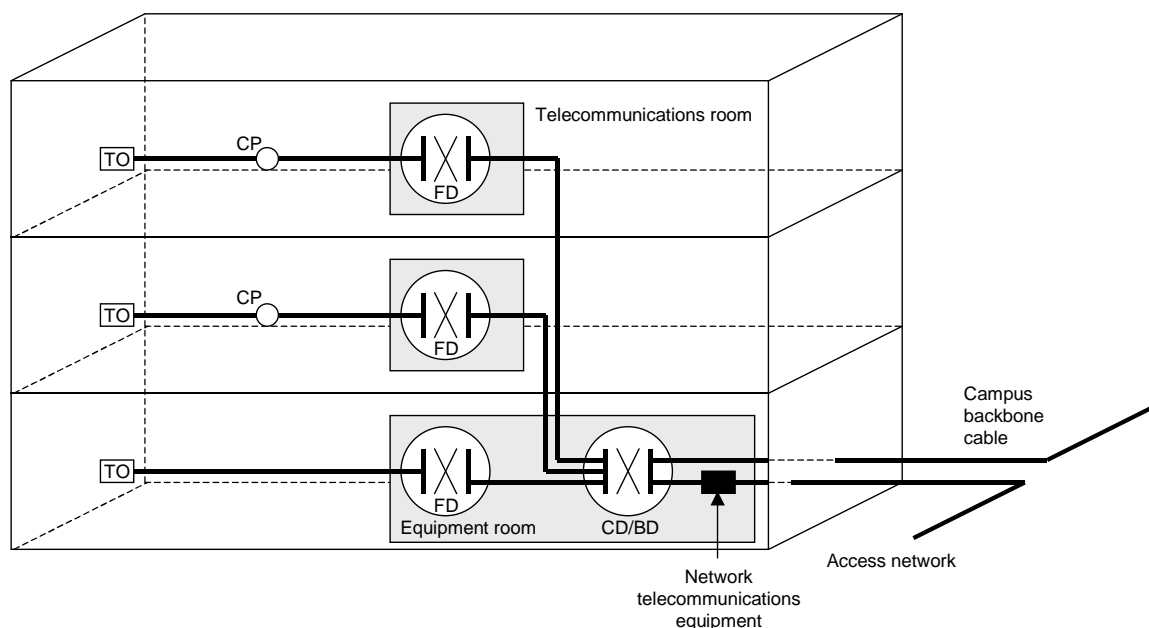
Building cabling infrastructure of EN 50173-2 [i.3]
